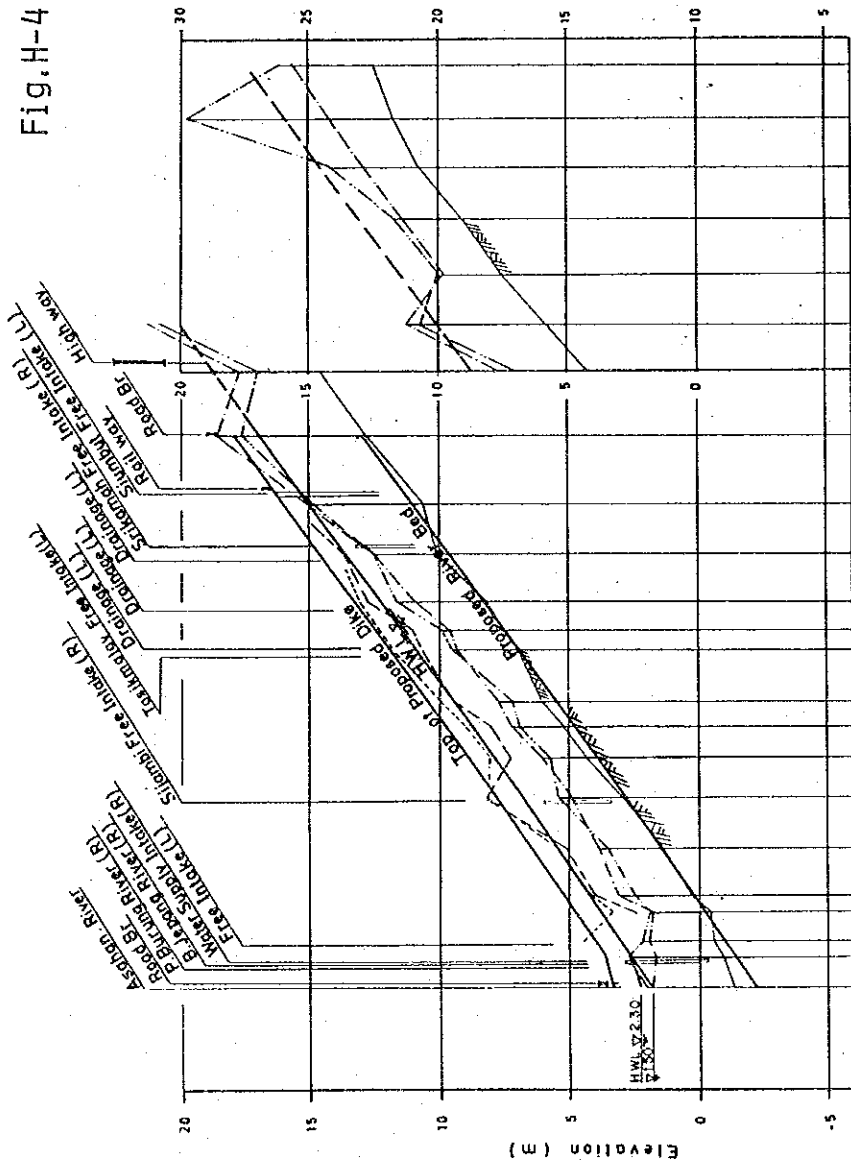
Proposed Long-Term Plan of Asahan AND Silau Rivers (5/6) (Longitudinal Profile of Silau River)
